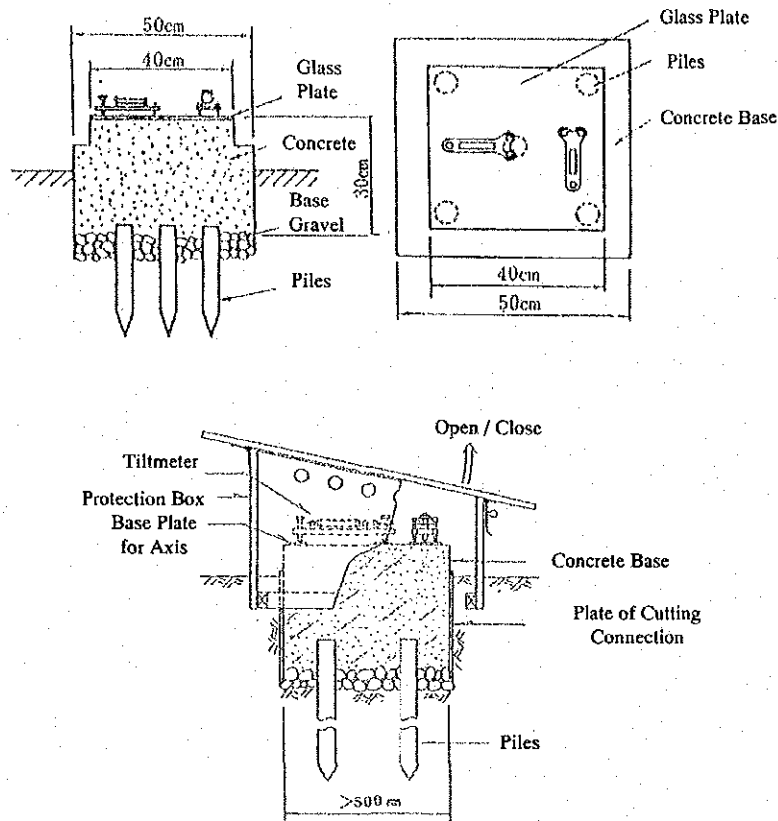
Typical Installation of Water Tube Tiltmeter (Ref. *14) p.125 - 126, Fig.2.1.2 (4), (5))
